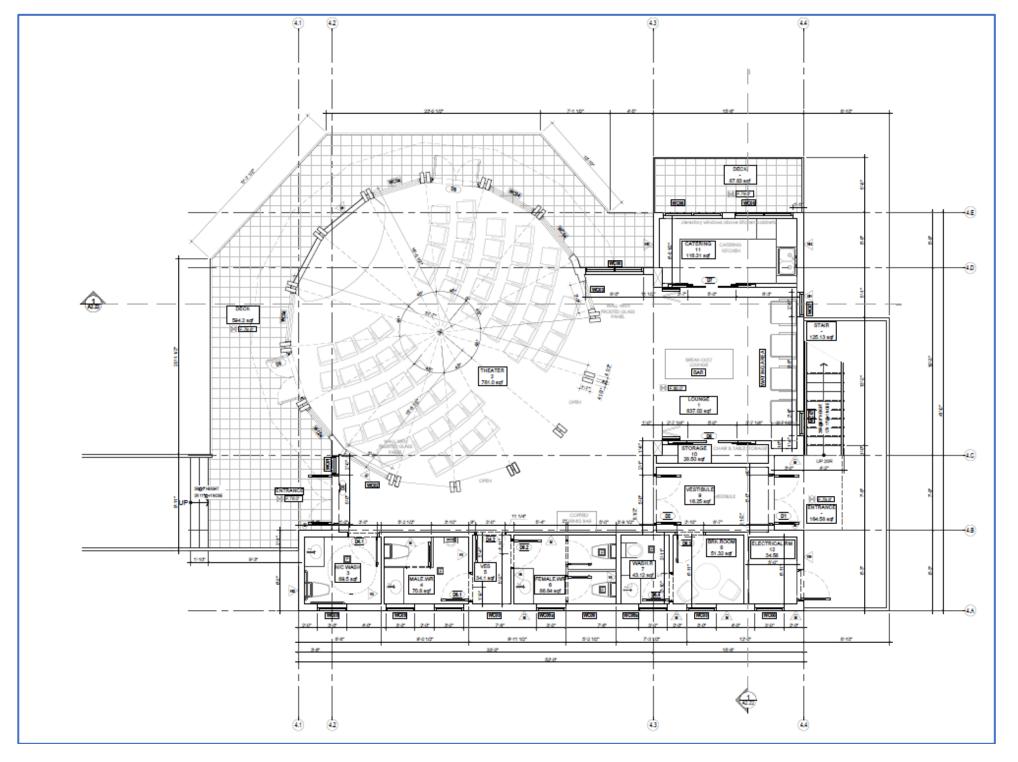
Lower floor of the Convention Room in the *Proposed Development* (this building is not visible in Figure 3). The lower floor of the Convention room will house a circular theatre, bathrooms and a panoramic deck. *Image modified from HNPA Architecture+Planning Inc. by Coastal Raintree Consulting, Ltd.
